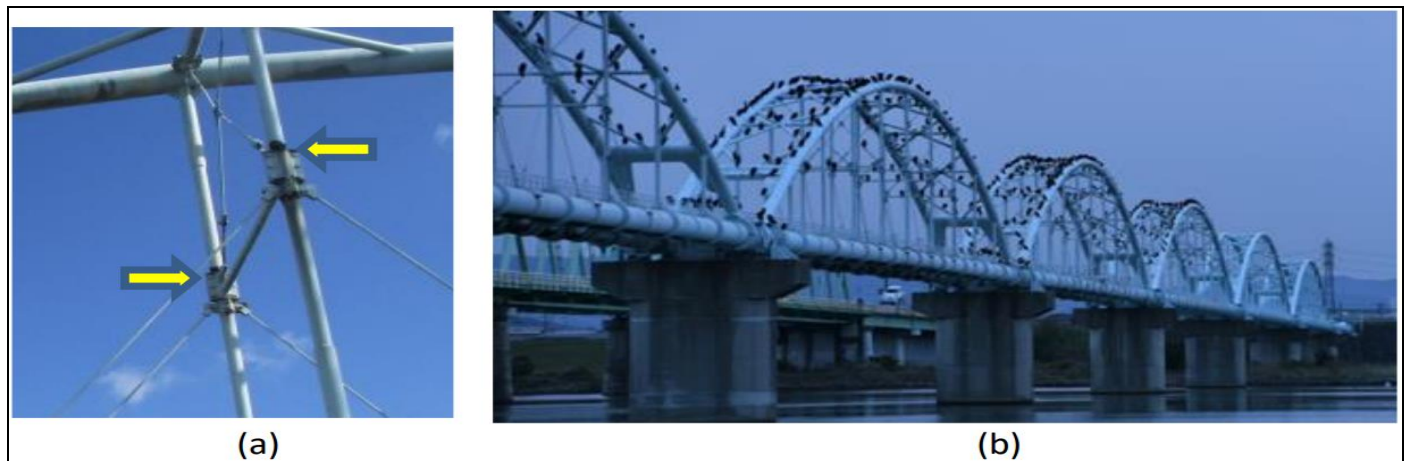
Fracture of hanging member above the window protection member on the P5-P6 span adjacent to the collapsed span (b) birds sitting on the bridge and effect of birds’ guano on the aqueduct bridge.
